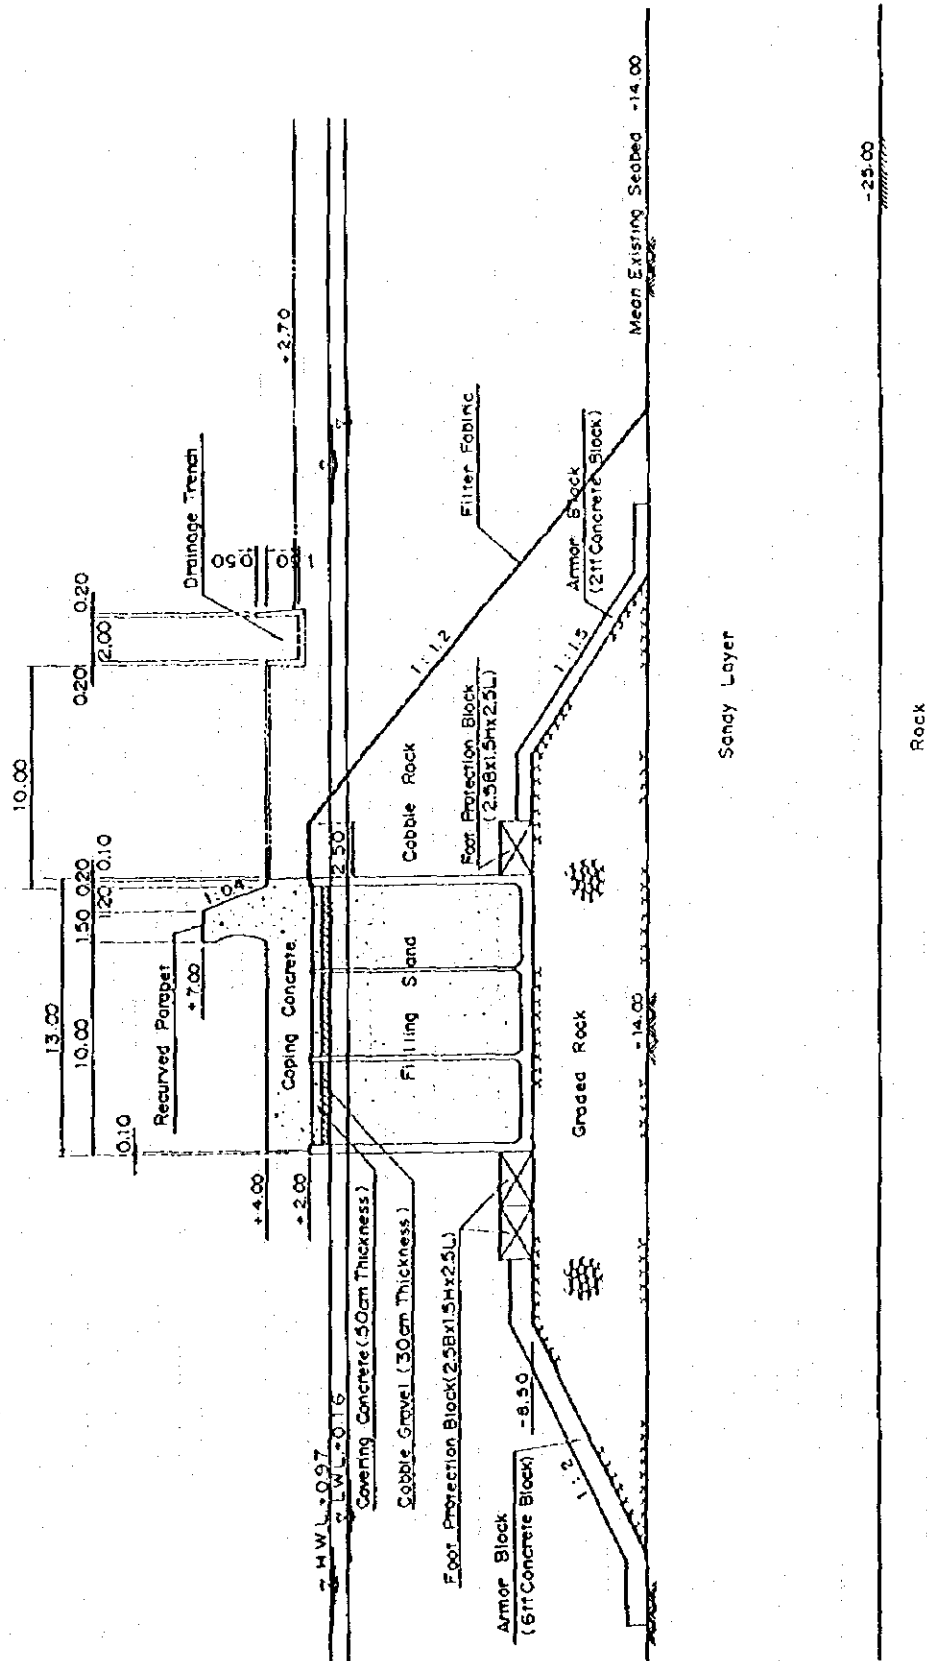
Standard Cross Section of Concrete Caisson Type D Seawall ④
